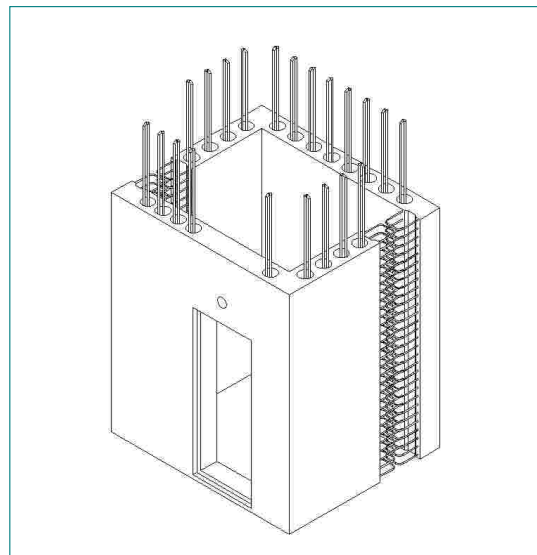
Precast household shelter in 2 separate 'L-shaped' panels (Patented)
